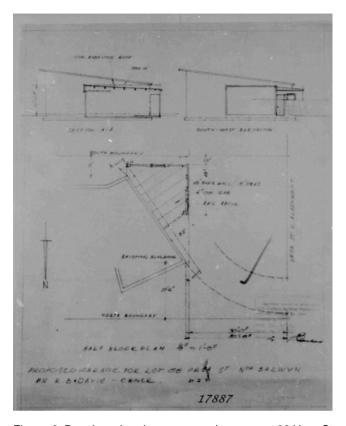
Drawing showing proposed garage at 32 Ursa Street North Balwyn. (Source: BP 17887)
